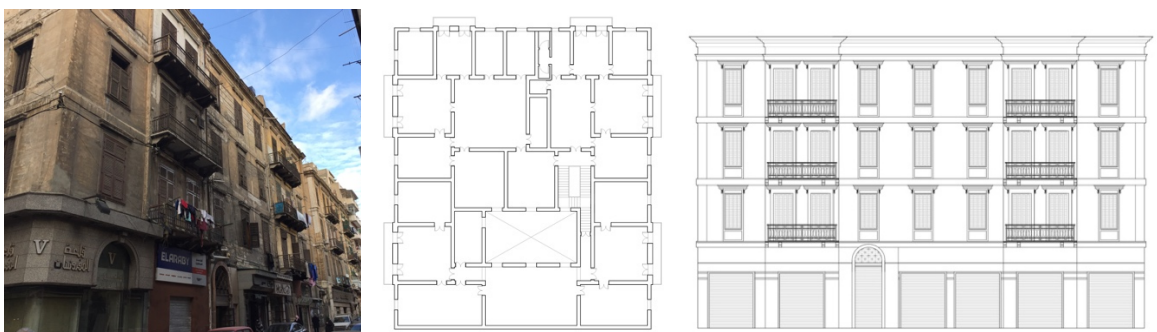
selected case study building, building image, plan, and façade from left to right
